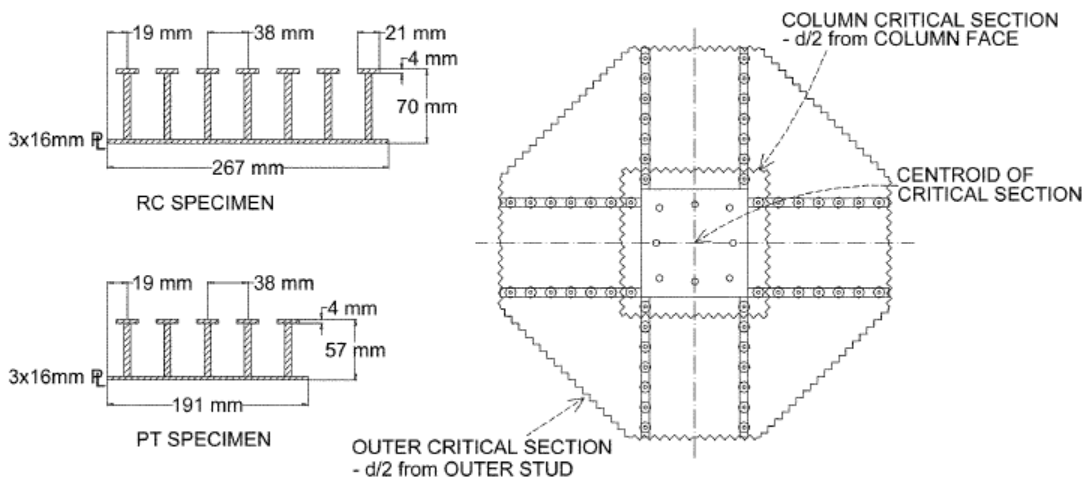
Kang and Wallace, 2004 [5] stud-rails disposition into the connection.
